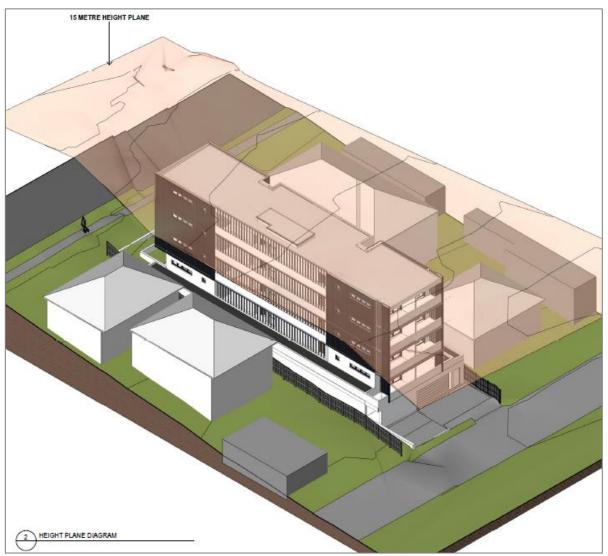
Model showing northern (rear) and eastern side elevation and 15m height plane
